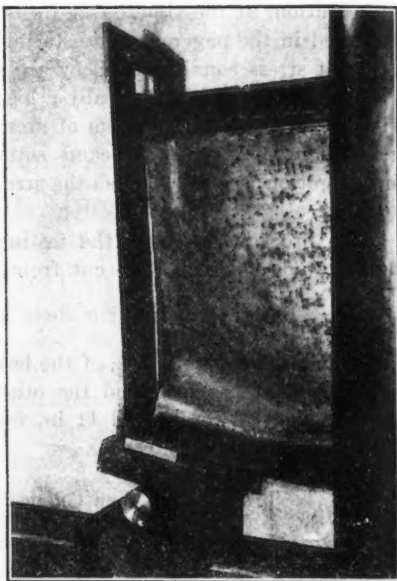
BEAM CT-1, SHOWING FAILURE AT THE SUPPORT DUE TO WEB CRIPPLING.
